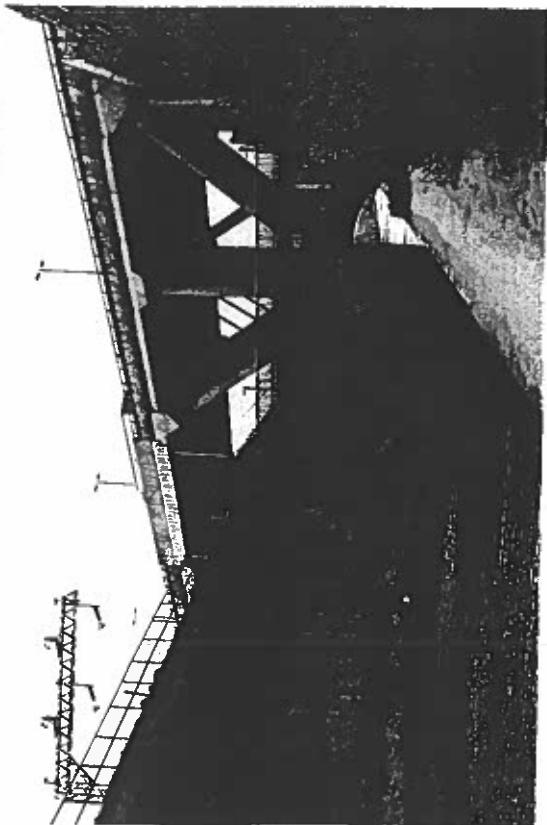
Steward Aqueduct, railway bridge and M5 viaduct
